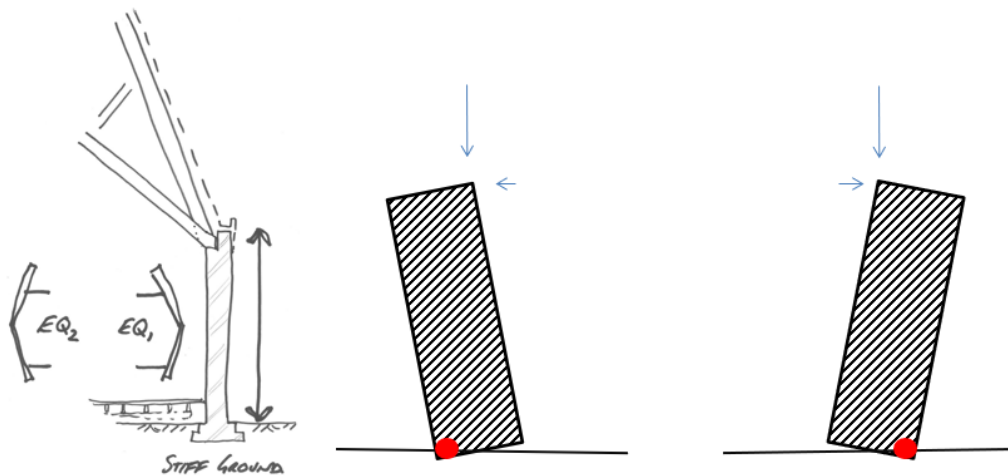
B.35: Axial load position for flexibly-tied roof load on wall
